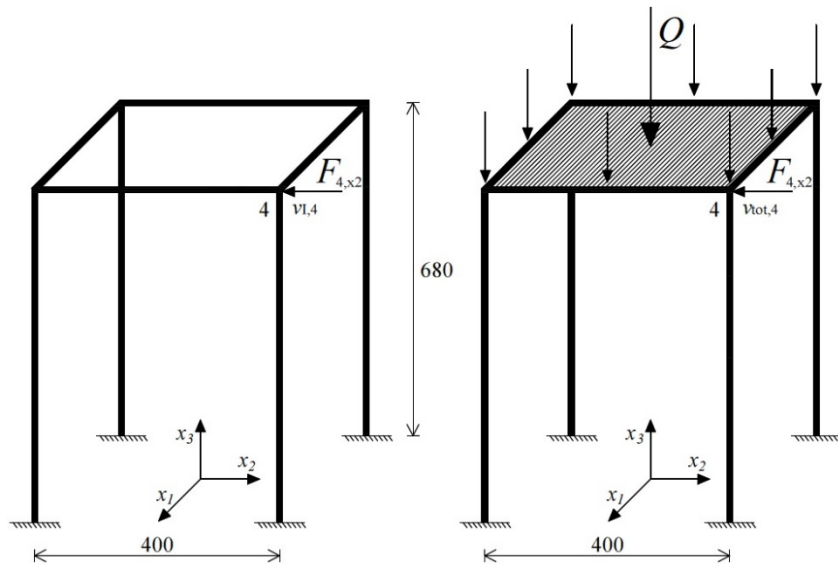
Magnification factor method. Unloaded (left) and loaded (right) space frame prototypes. Layout verification tests, with the instrumented section being located at point 4. Units: mm.
